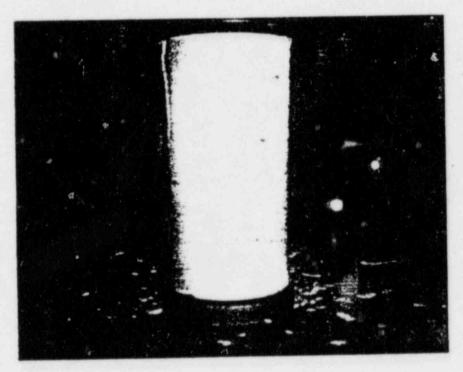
Test Specimen #1 Spalling Indication
